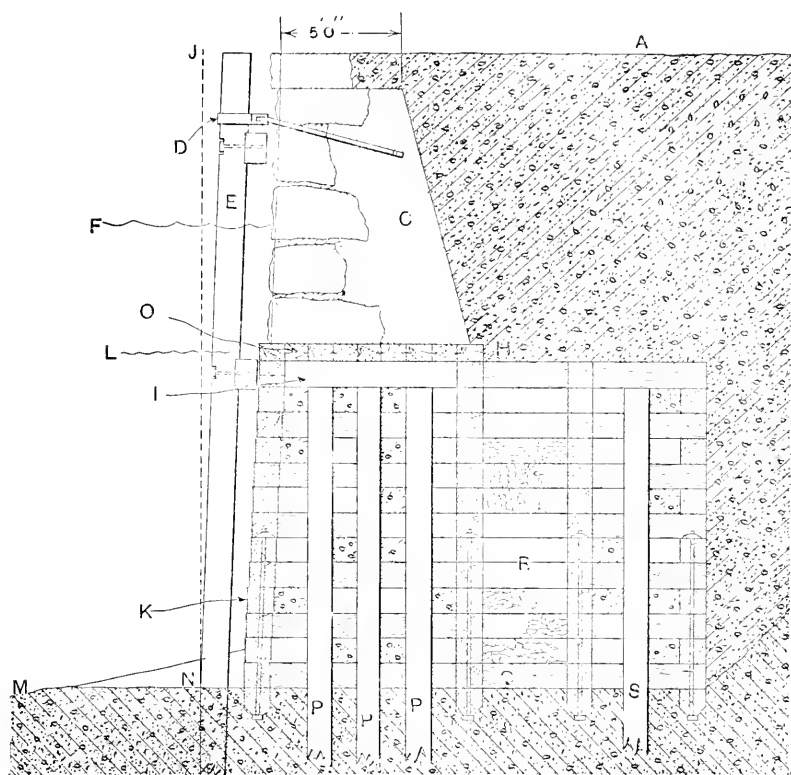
CROSS SECTION THROUGH CRIB AT PROVIDENCE, R. I.
